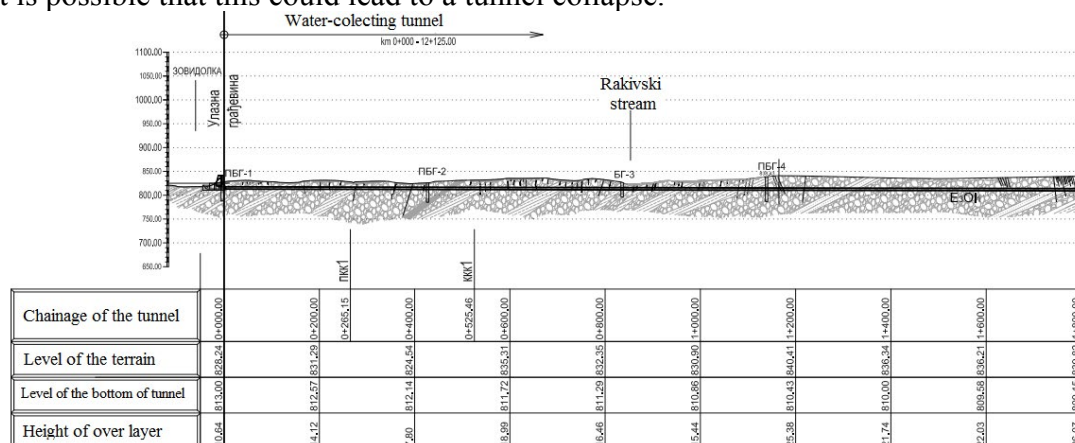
The longitudinal cross-section of part of the water-collecting tunnel
